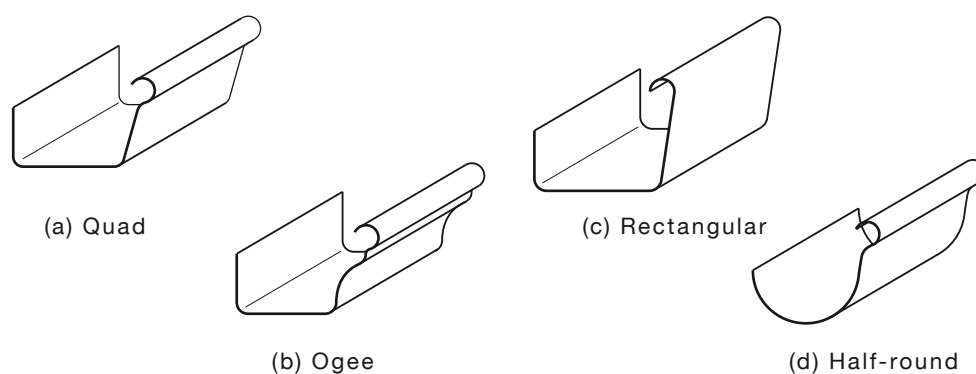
(A) TYPICAL EXTERNAL EAVES GUTTERS
